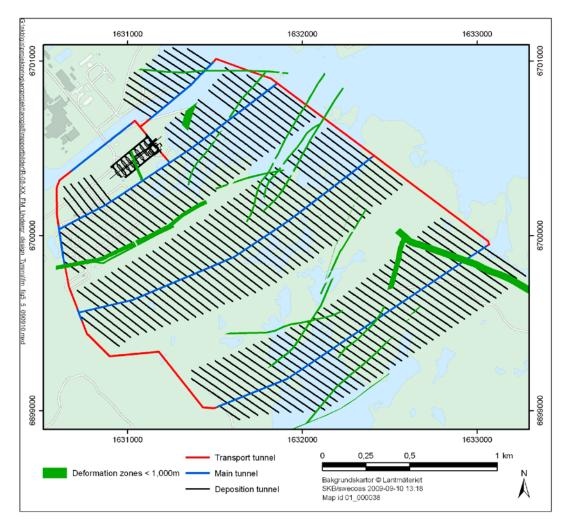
Proposed layout in relation to deterministically modeled deformation zones that are shorter than 1,000 m. Section at -470 m (RHB 70).
